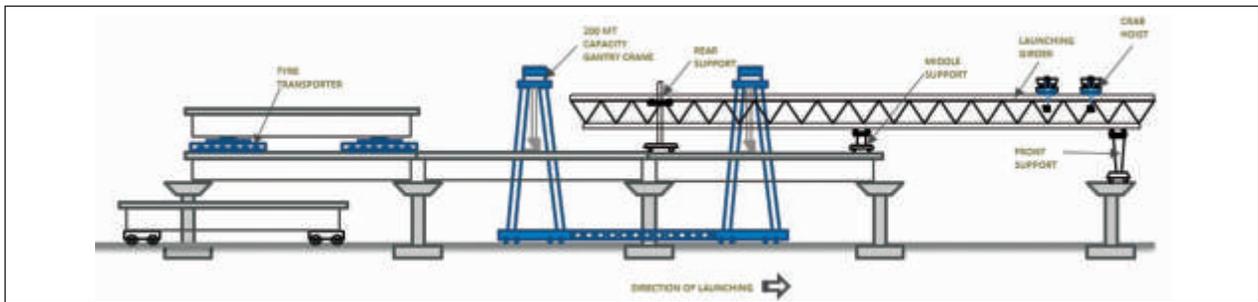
LG assembly with Gantry crane & Tyre-transporter loading
